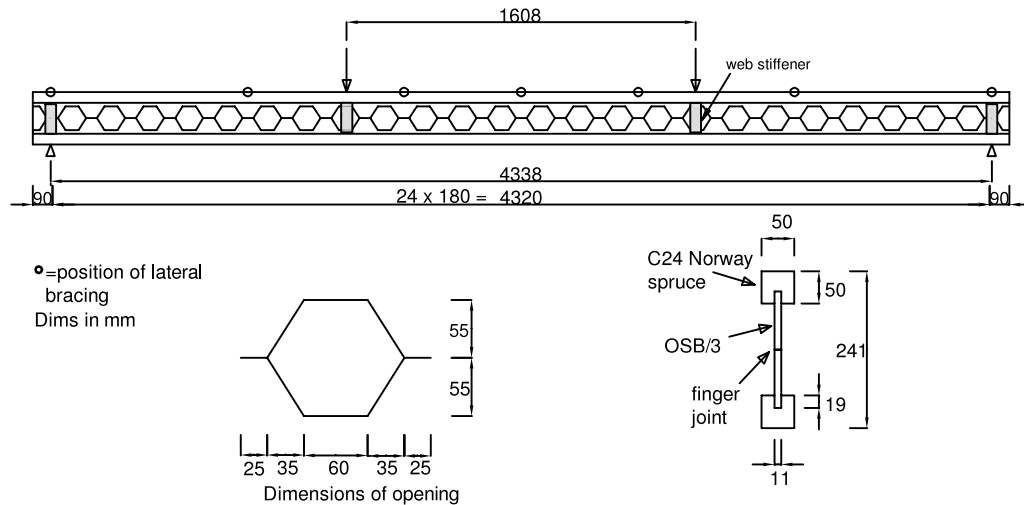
Details of 241 mm deep castellated joist – bending test arrangement.
